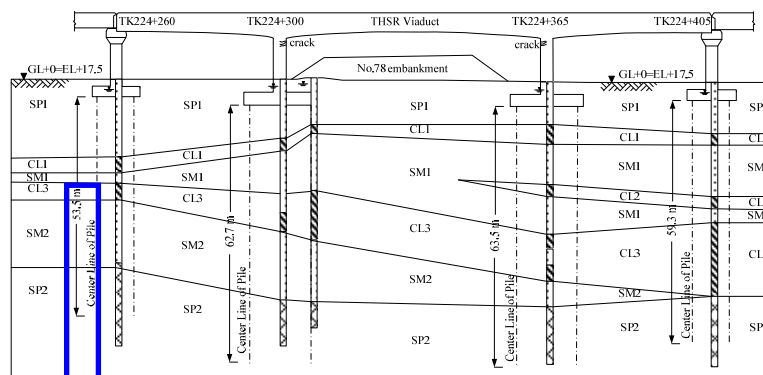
The 3-span viaduct, the cracked piers, and the pile foundations
